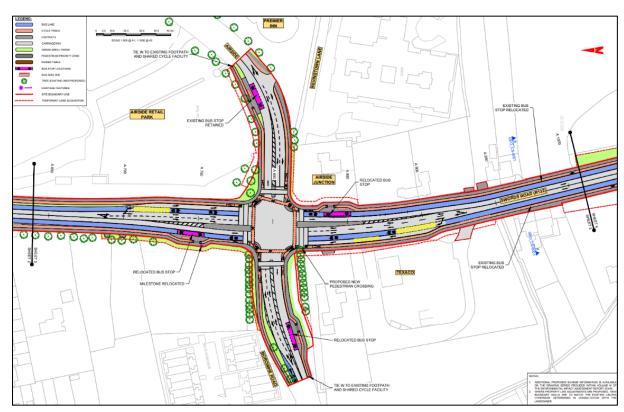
Extract from General Arrangement Drawing (Sheet 3)
